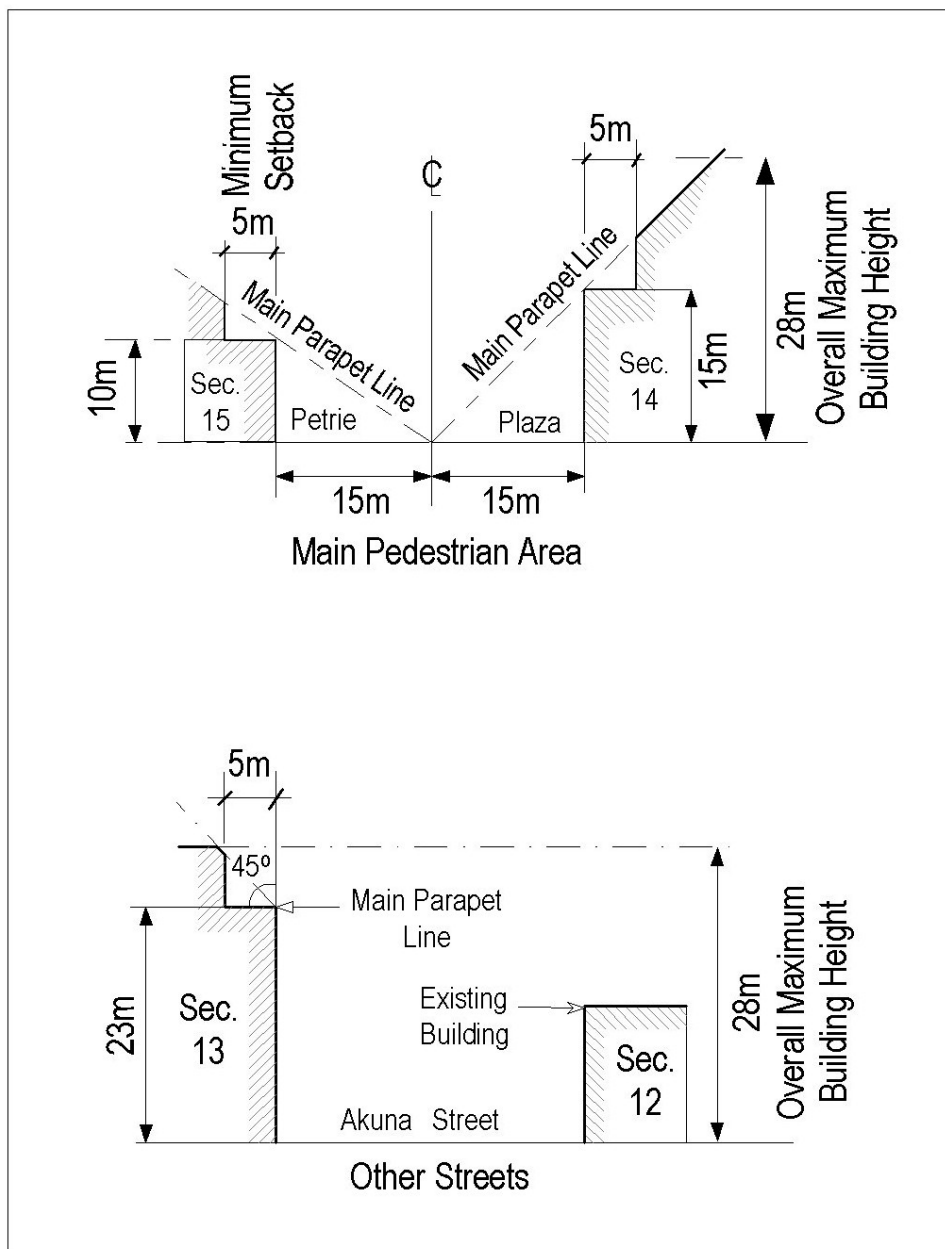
City CZ1 Zone— building height areas 5 and 6 - height plane diagrams
